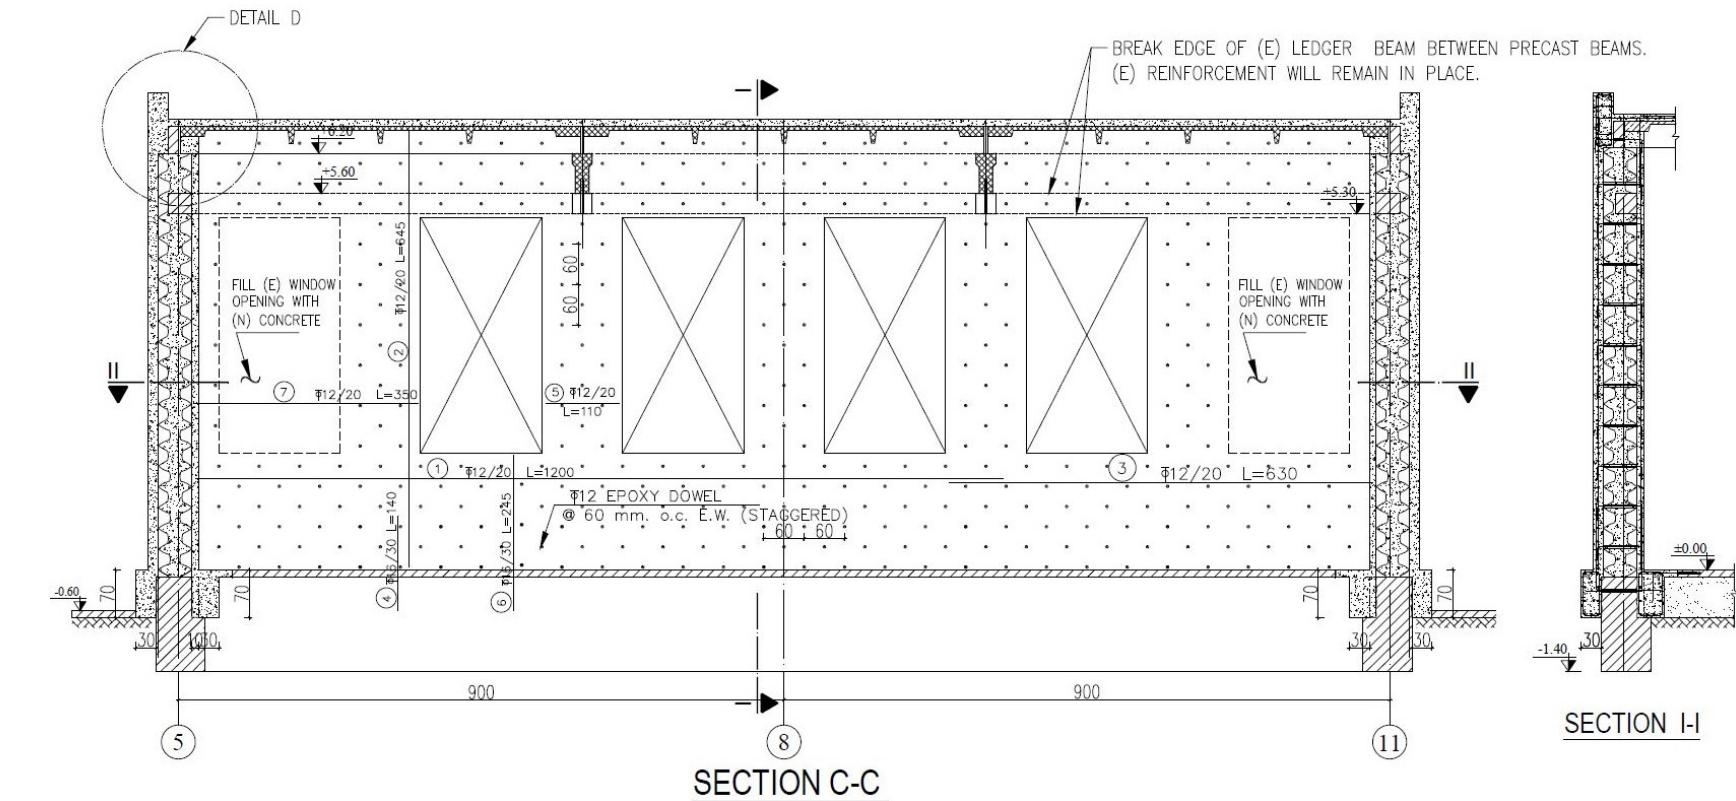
Typology A typical gymnasium - longitudinal section and details.
